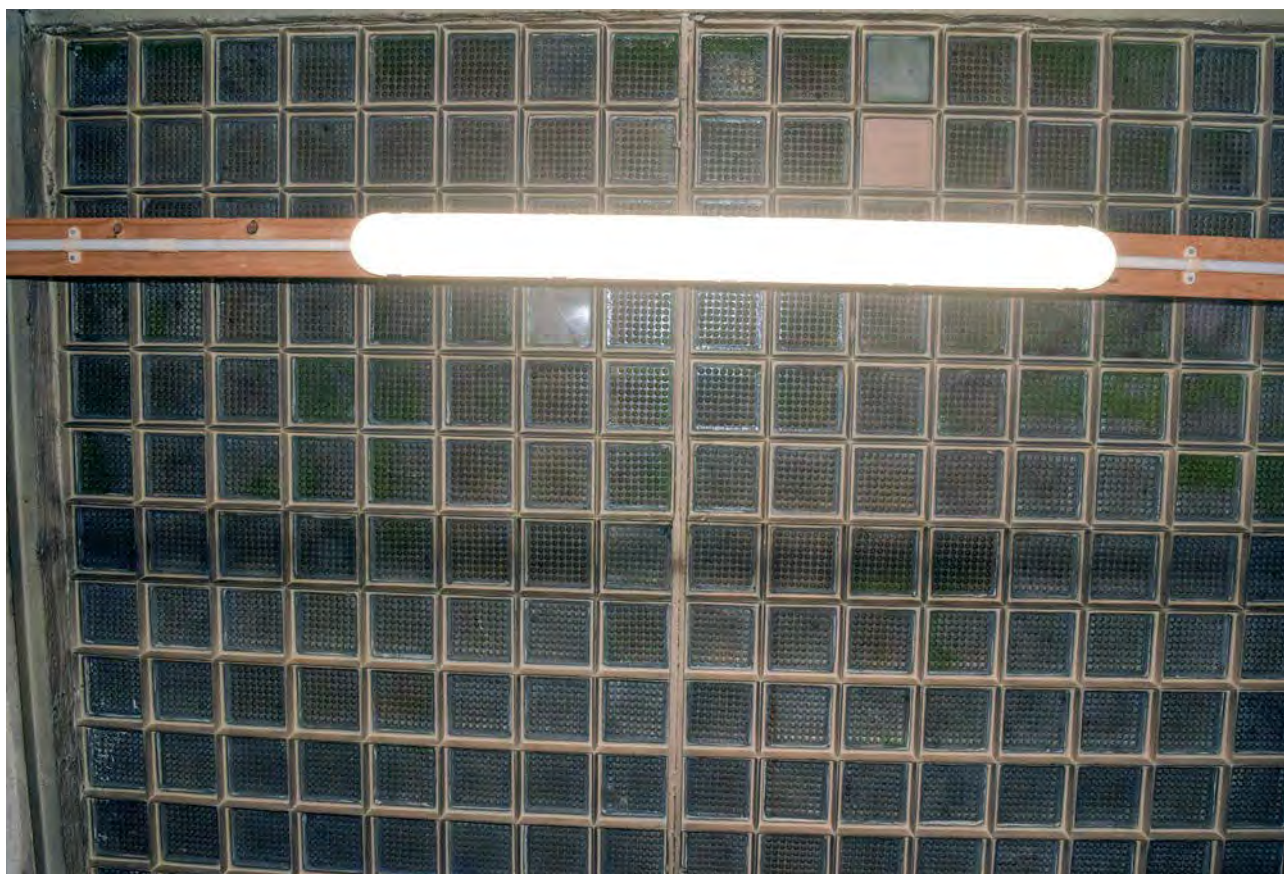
The ceiling of the sub basement of 31 Cornmarket Street
